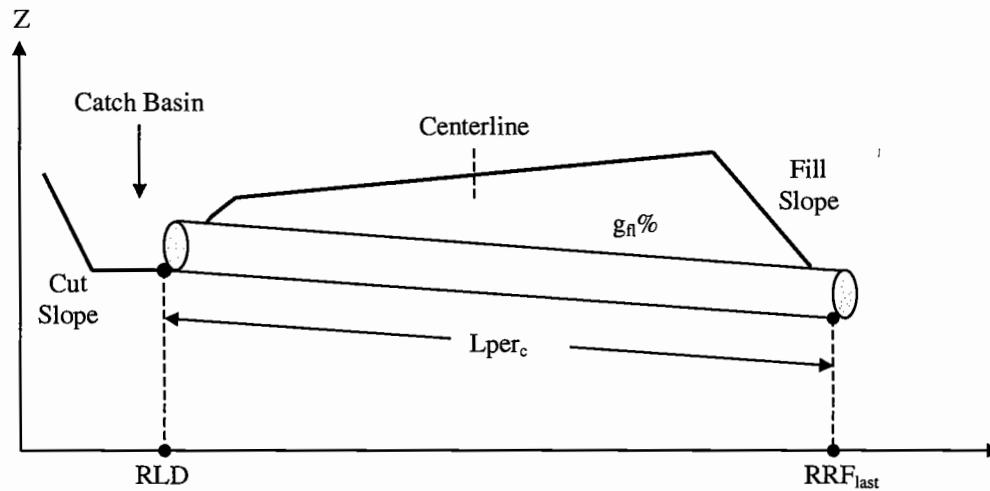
Scenario 1: Geometry of a ditch relief culvert.
